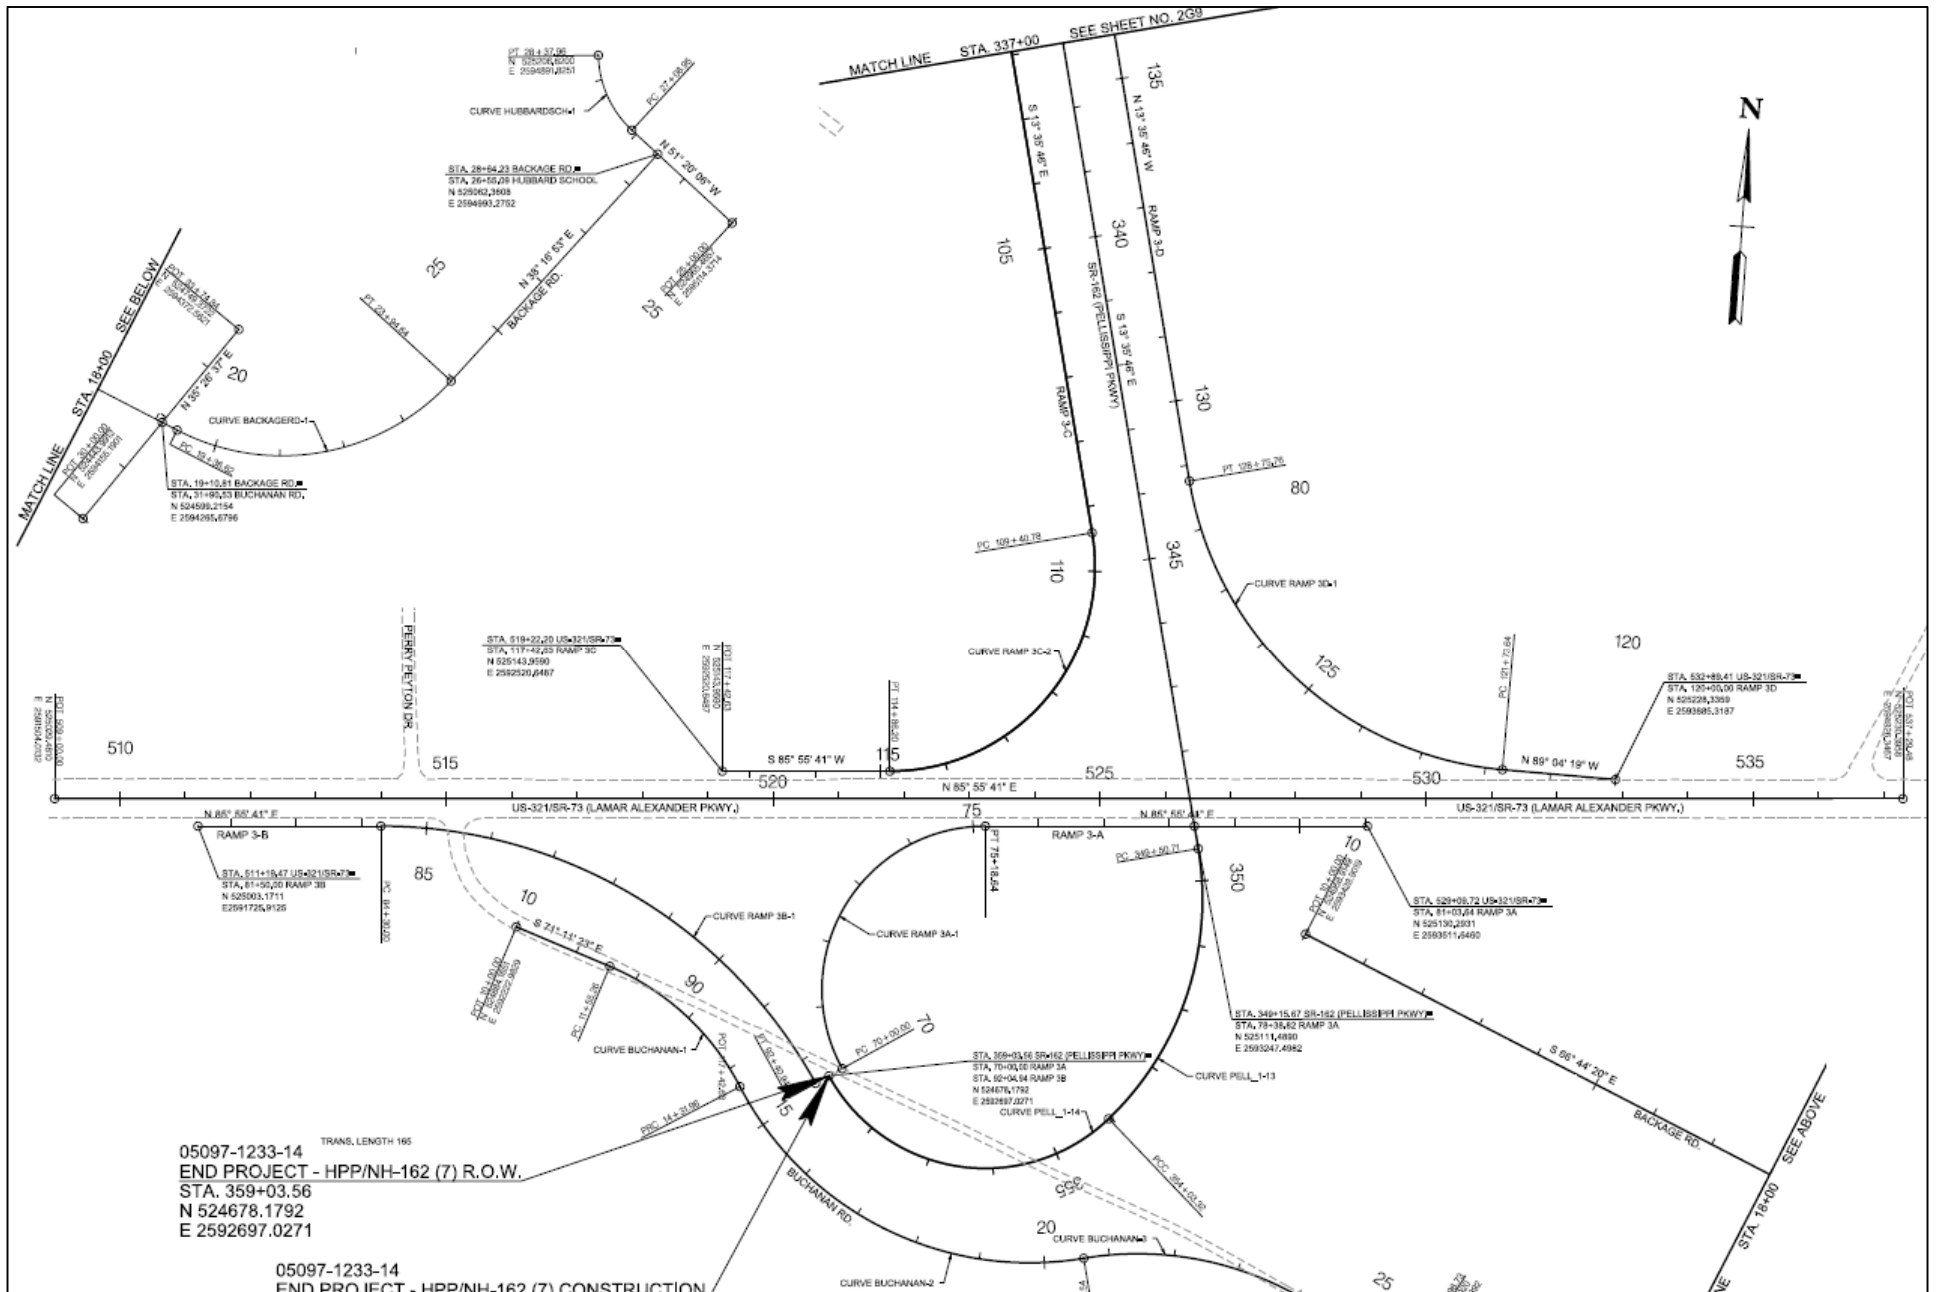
Overview 11 of 11 of the SR-162 Road Extension project from north to south.
